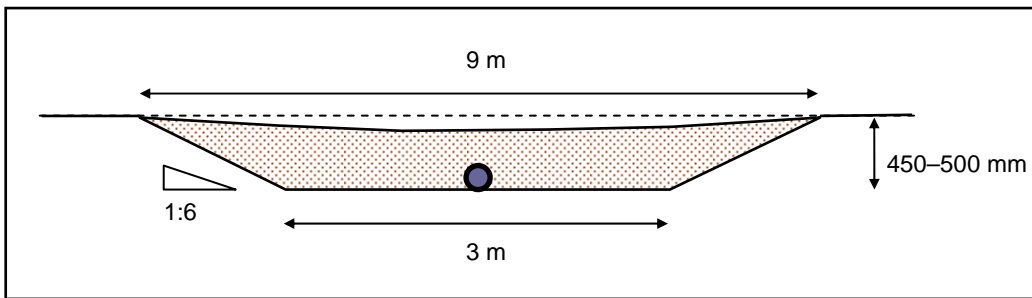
Cross-section of slightly parabolic wall across drain channel with a suitably sized pipe in the base of the wall
